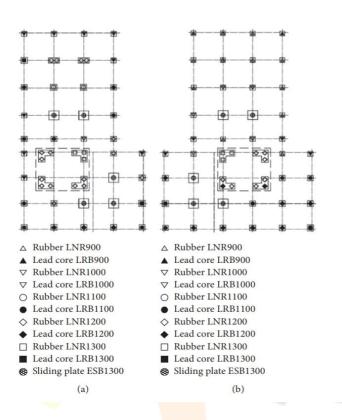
Arrangement of isolation bearing in the isolation layer(a) Tower B (b) Tower A
